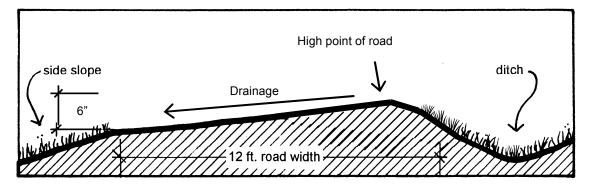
Super-elevation profile: 1/2 " of super-elevation per foot of road width (e.g., 1/2 " x 12' road = 6" crown).
